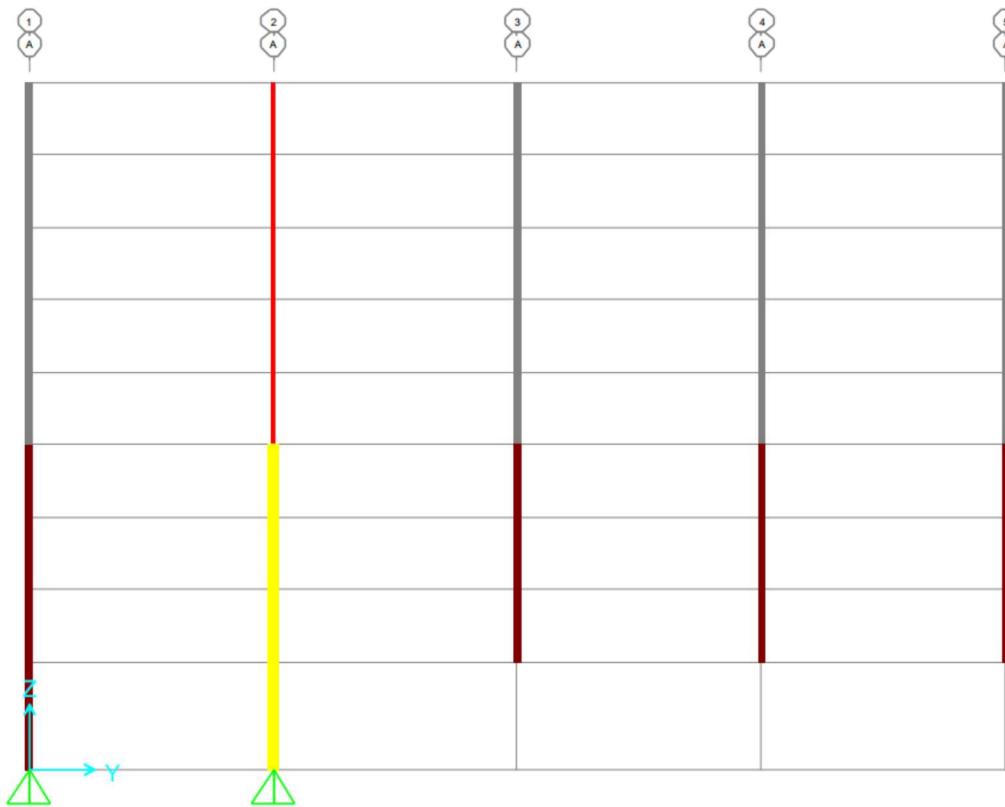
Column cross-section layout in the face A (SAP2000)
